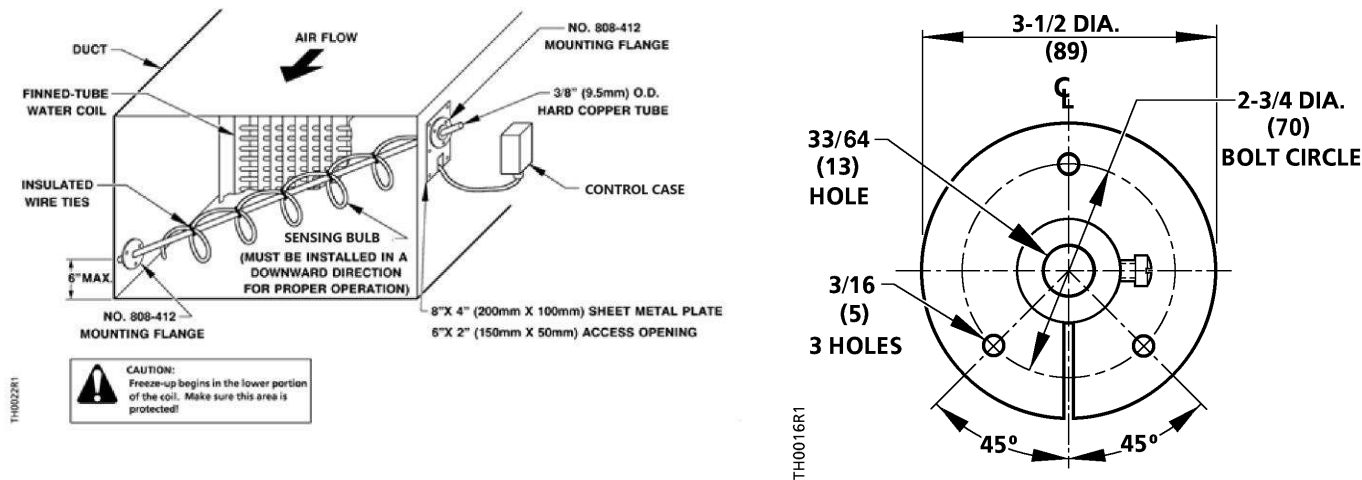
Bulb Mounting for Limited Access Ducts with Mounting Flange.
